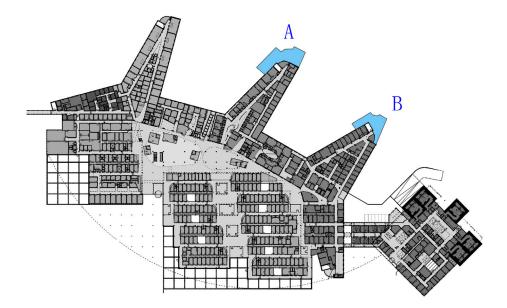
The extension of fingers in the hotfloor (Adapted from the floor plan provided by Deventer Hospital)
